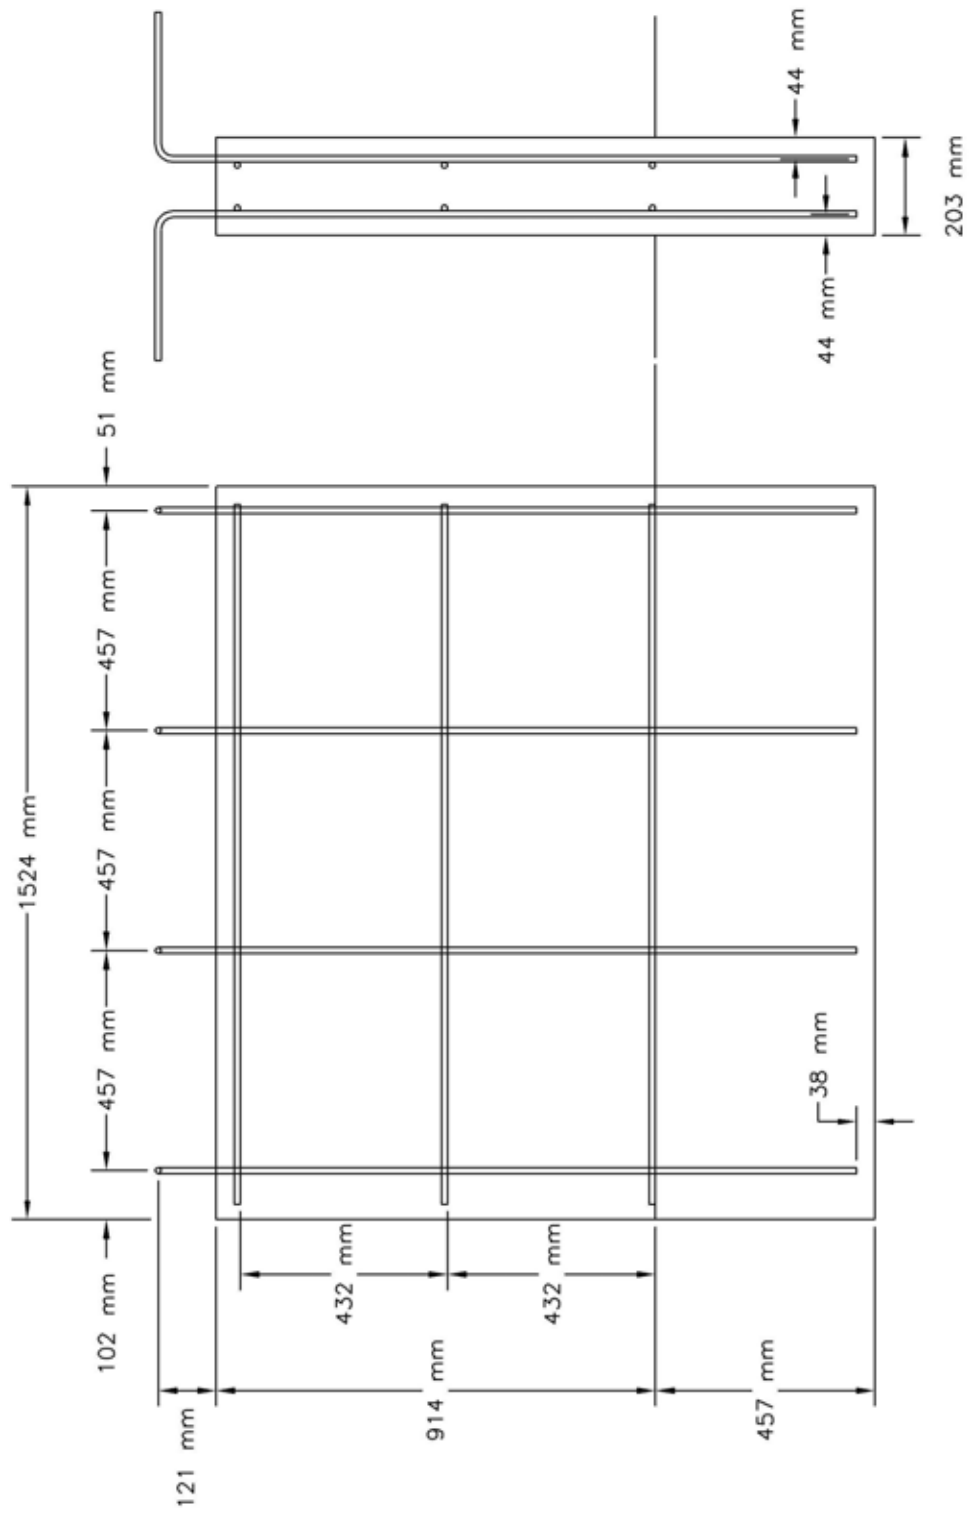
Concrete Culvert Substructure Details - Inside Culvert Wall
